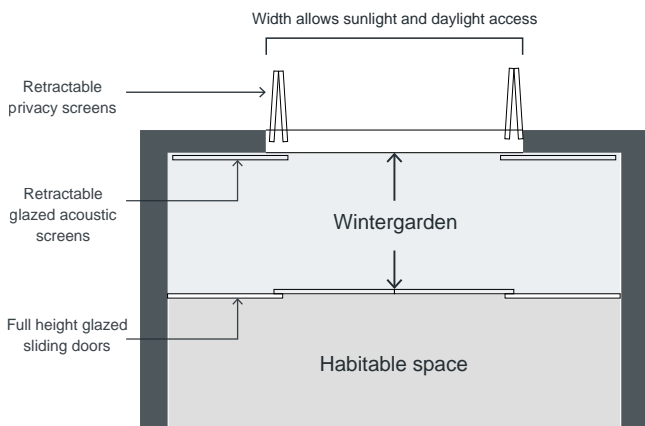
J.5 Balconies designed as acoustically sealed wintergardens can improve liveability of the balcony and adjoining habitable rooms. In considering how much of the facade is solid or open, the width of the openings needs to be sufficient to allow sunlight and daylight access
